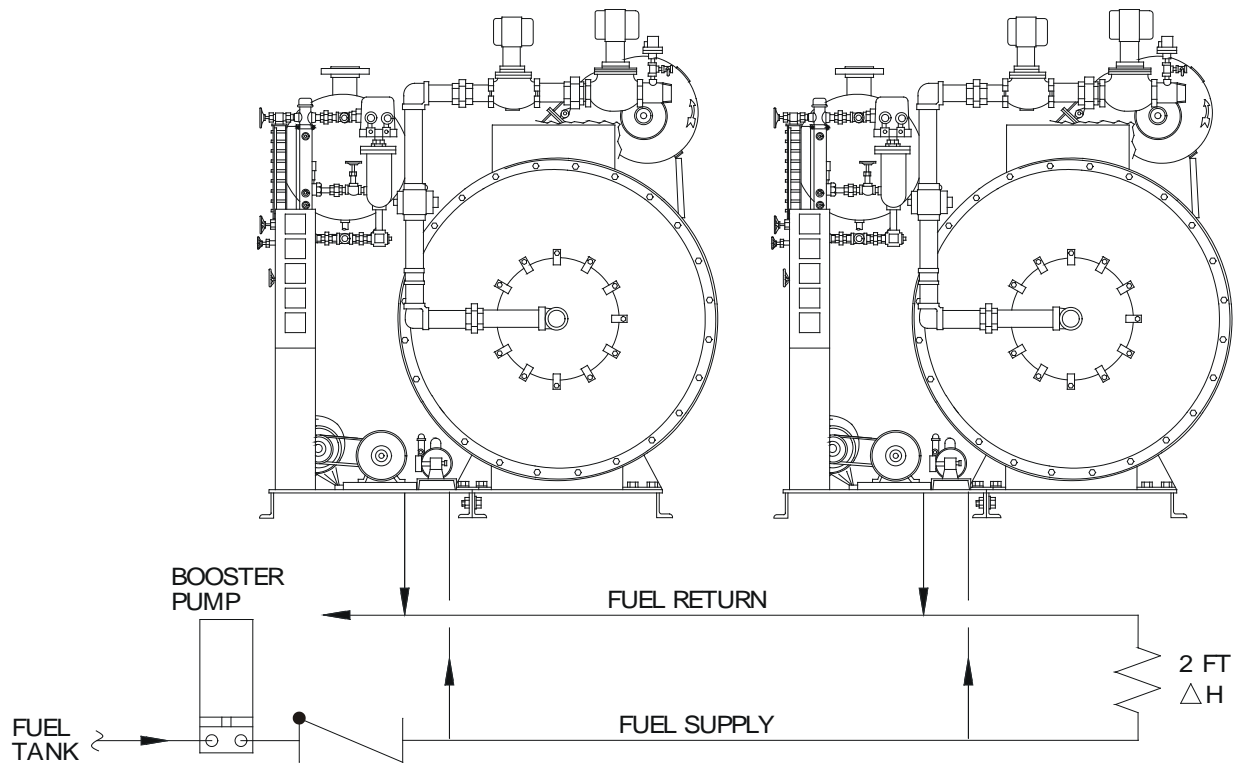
“Open” Loop Fuel Oil Piping Arrangement
